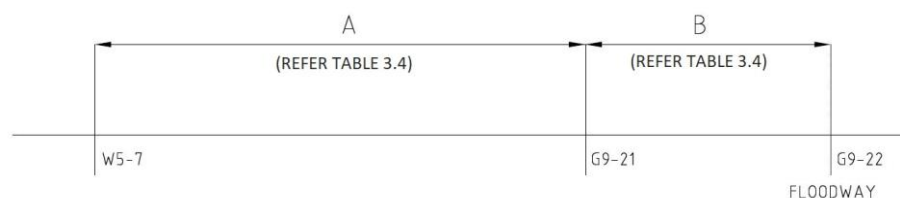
Floodway sign required spacing (Standards Australia, 2009).
